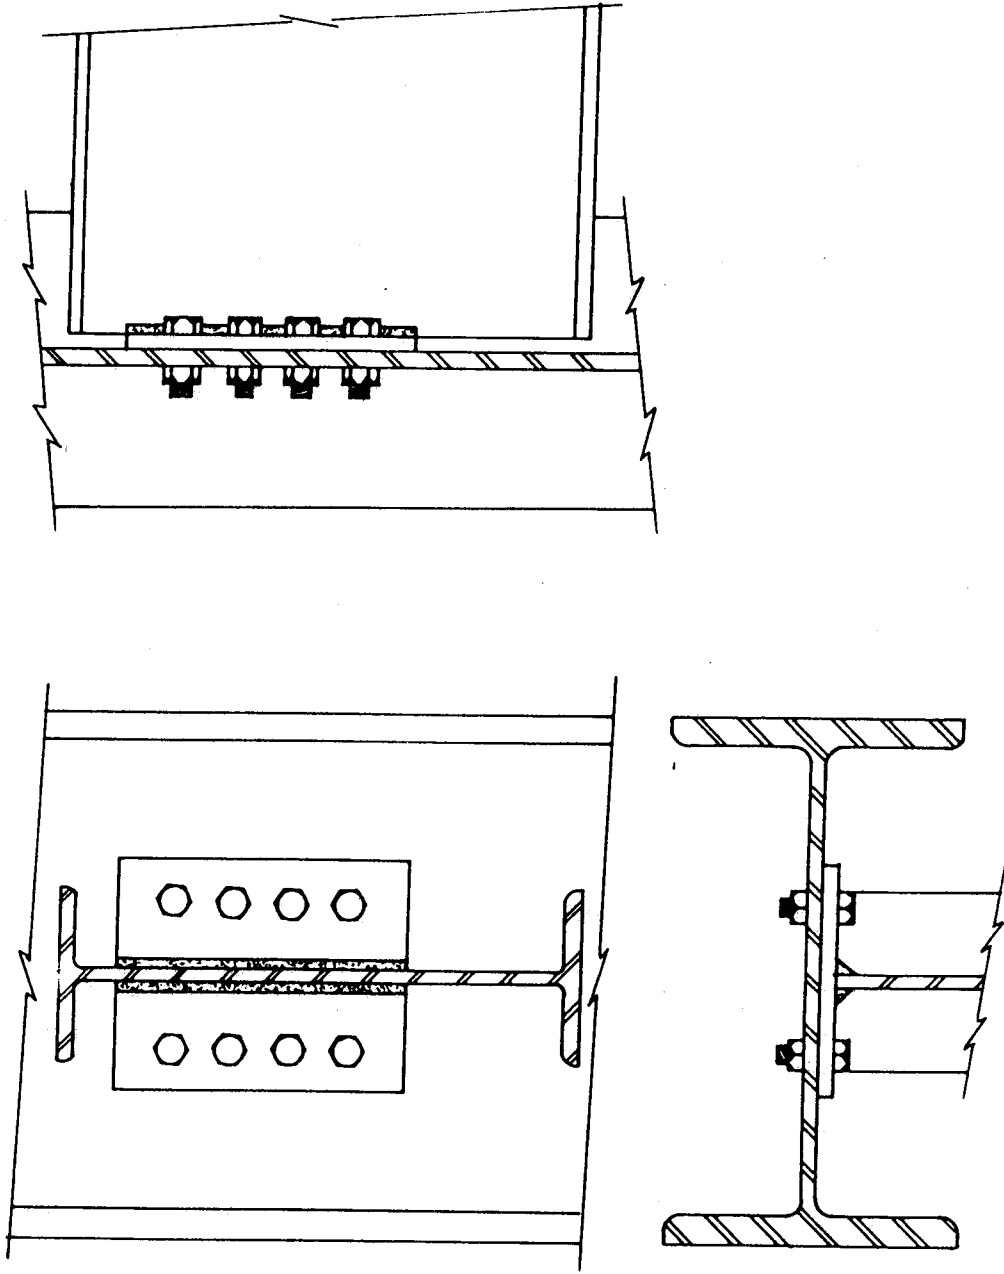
Single Flexible End Plate Connection to Column Web Detail
